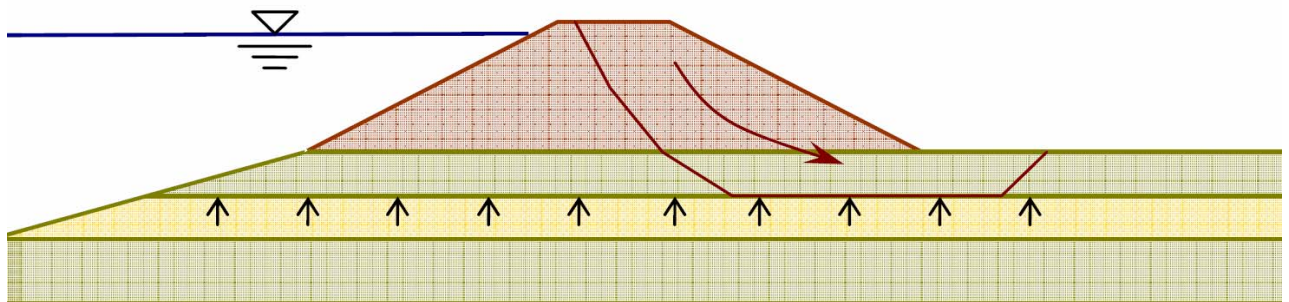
Foundation failure of embankment dam (Morris, 2009a).
